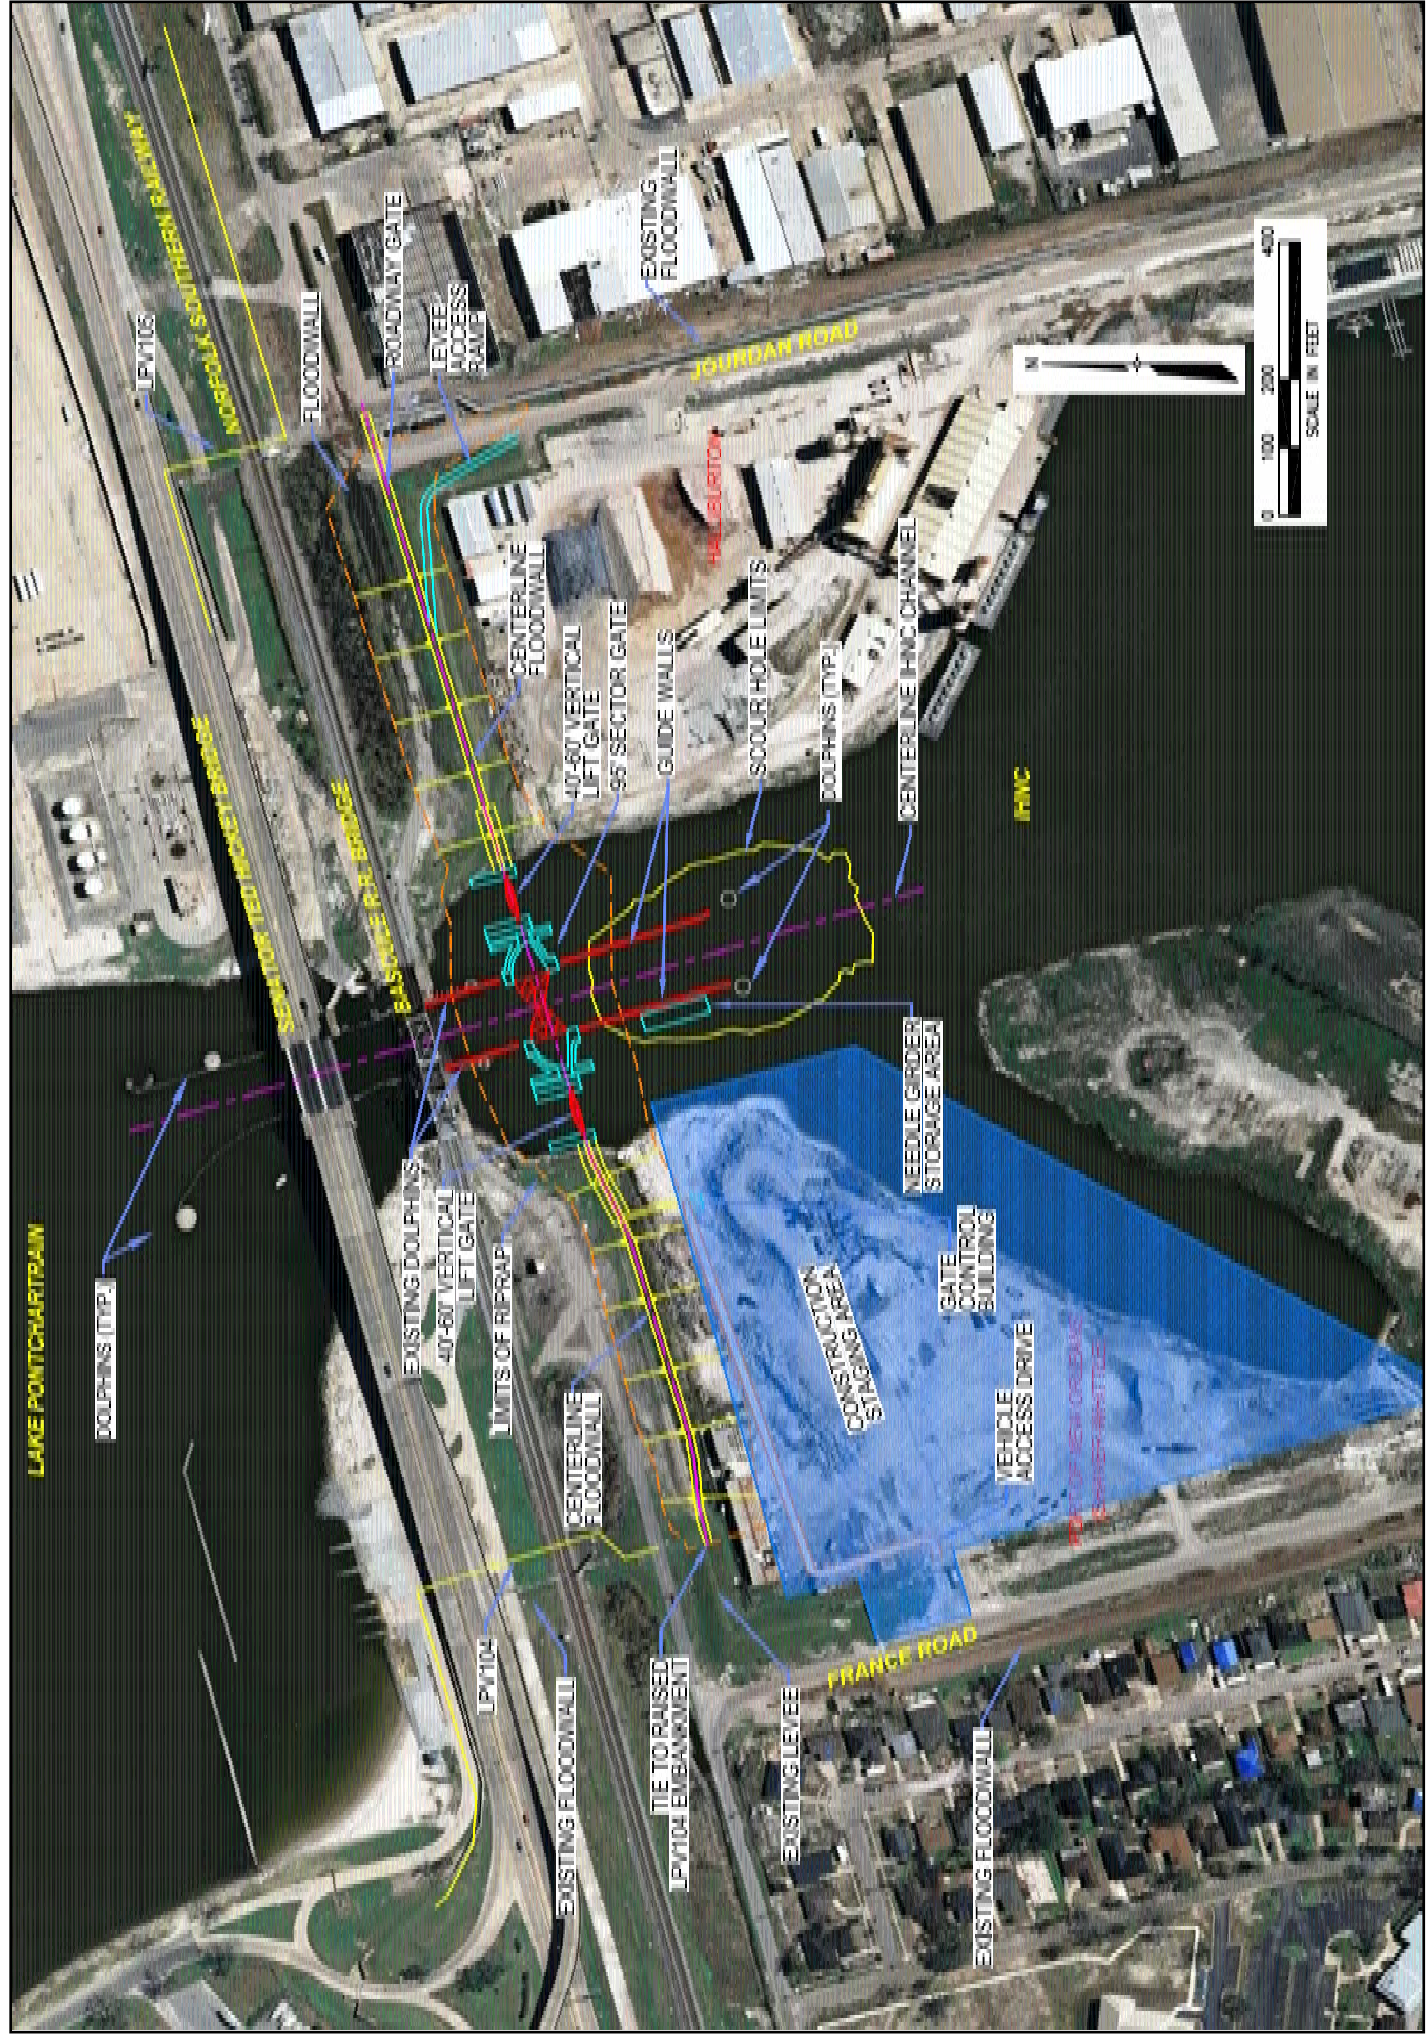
Diagram of Alternative #2 - Bridgeside Alignment 398 ft south of Seabrook Bridge
